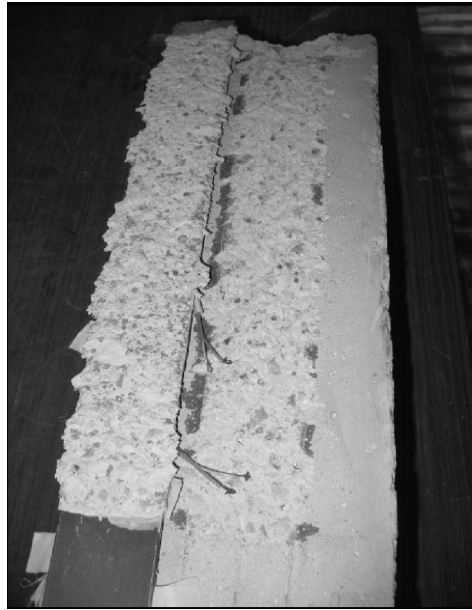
Failure mode: debonding in concrete (DB-C)
